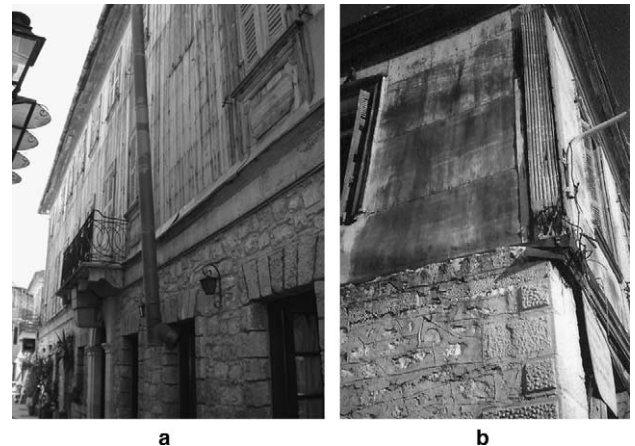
Protection of timber elements: (a) by timber planks; (b) by metal sheets.
